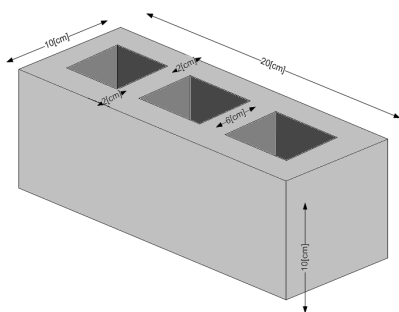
Geometry of a concrete block used to construct the concrete wall depicted in figure 19.
